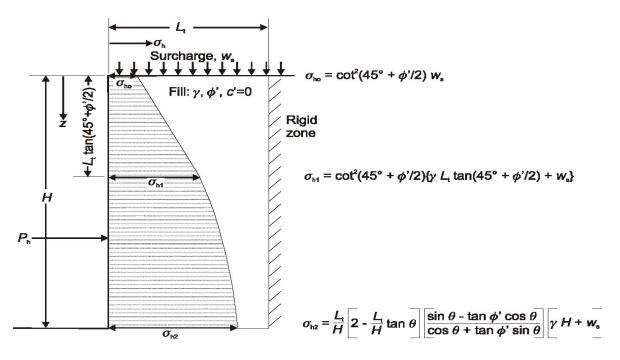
Horizontal stress distribution acting on rear of wall facing due to self weight and surcharge and the gross horizontal force P_h is;
